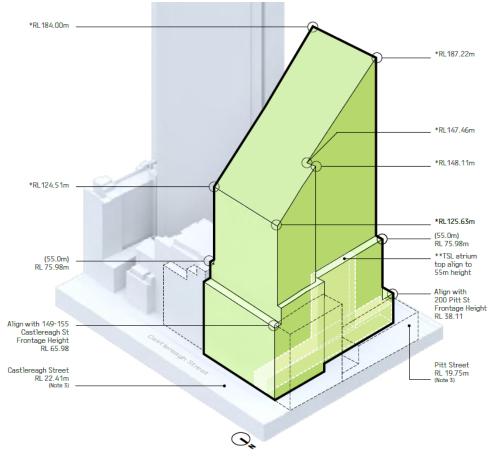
Building Envelope – North Western Perspective Source: 3XN
